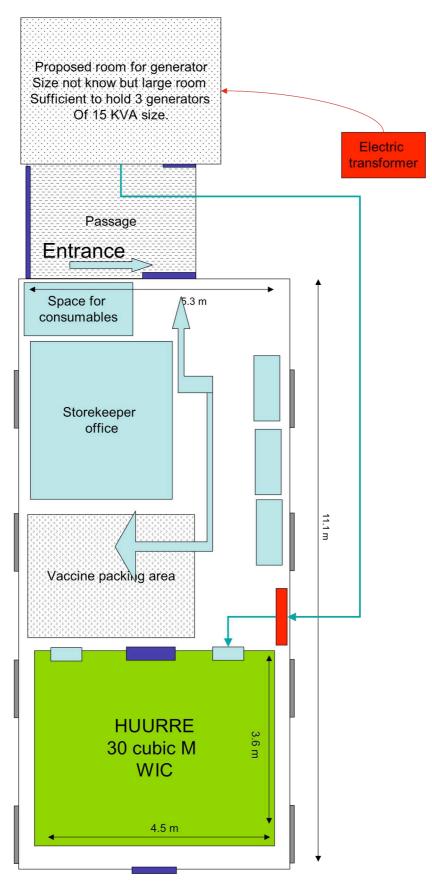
Proposed layout for Bolangir vaccine store and placement of 30 M3 WIC
